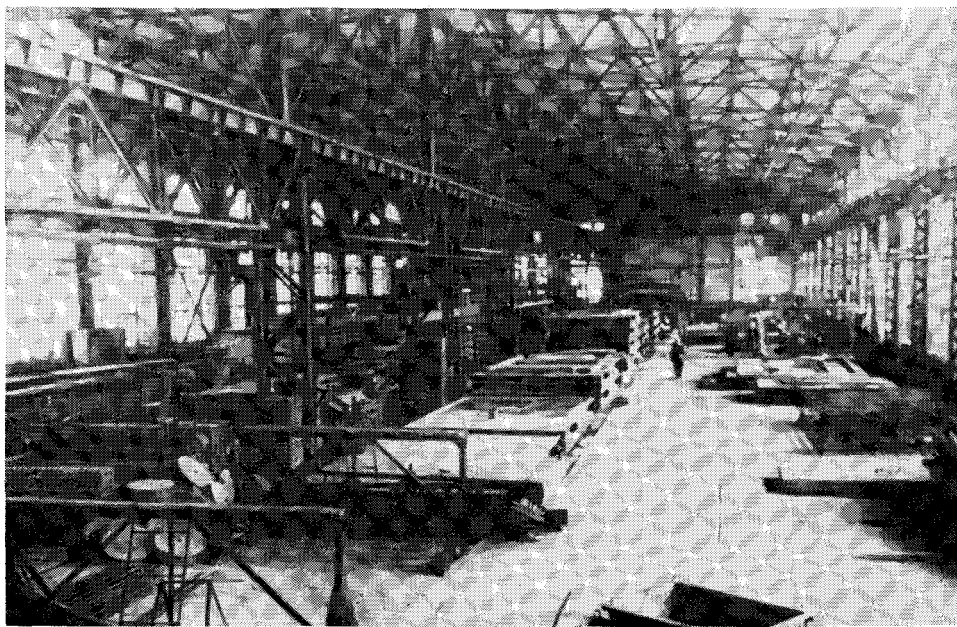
Some typical prestressed cored slabs for apartment buildings.
